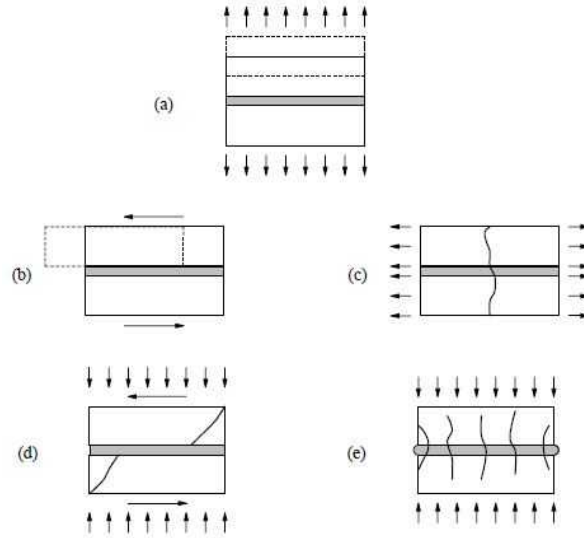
Masonry failure mechanisms: (a) joint tensile cracking; (b) joint slipping; (c) unit direct tensile cracking; (d) unit diagonal tensile cracking; (e) masonry crushing [23].
